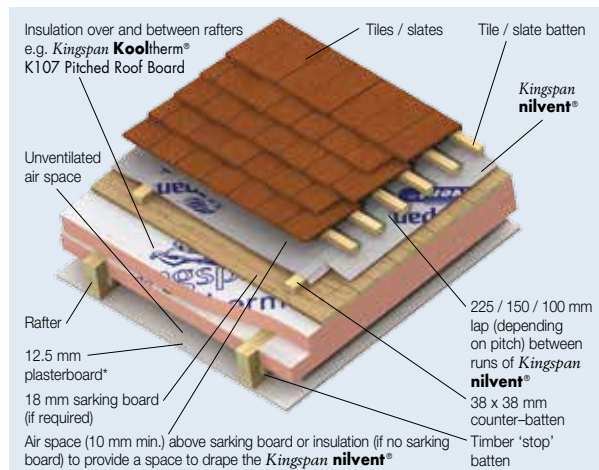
Insulation Over Rafters – Sarking Board / No Sarking Board – Battens & Tiles
